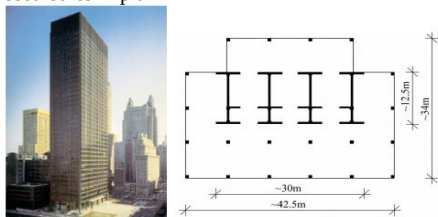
Seagram Building, New York, USA, 1958 (photo courtesy of Antony Wood / CTBUH)
